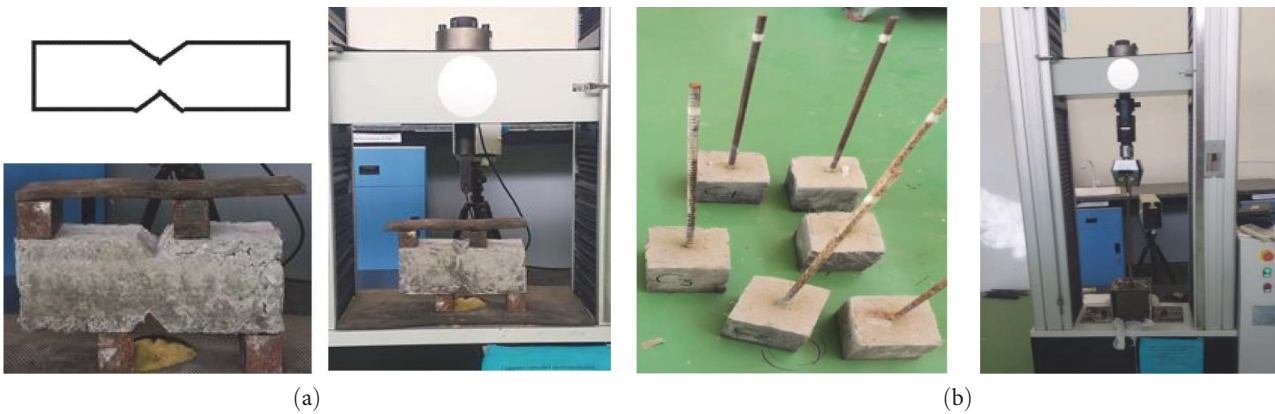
(a) Shear test setup and (b) pullout test setup.
